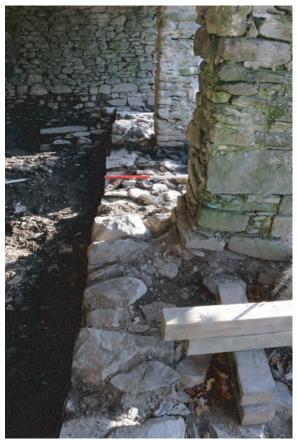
Cart Shed - Refectory west wall. Looking south along line.
